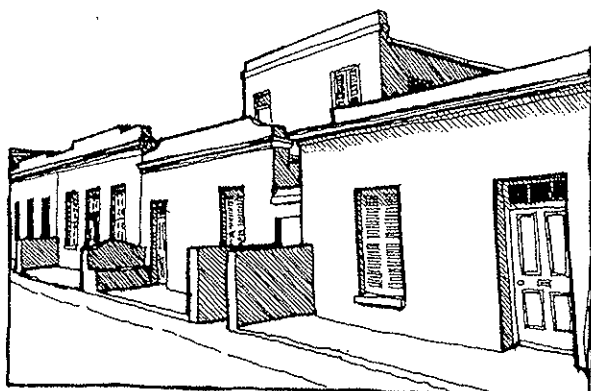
A set-back first floor has a minimal impact on the streetscape.
